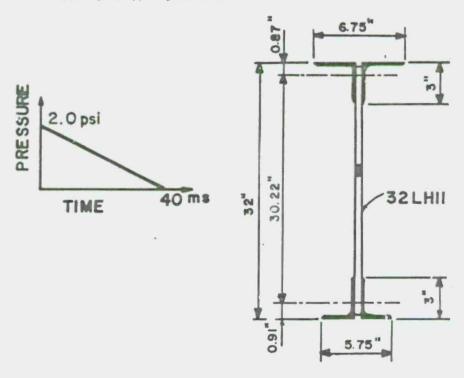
A-5 (a) Joist cross-section and loading, Example 5A-5(a)
